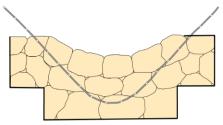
Design of foundation & spillway Source: GFA-Amhara (Jan 2013)
